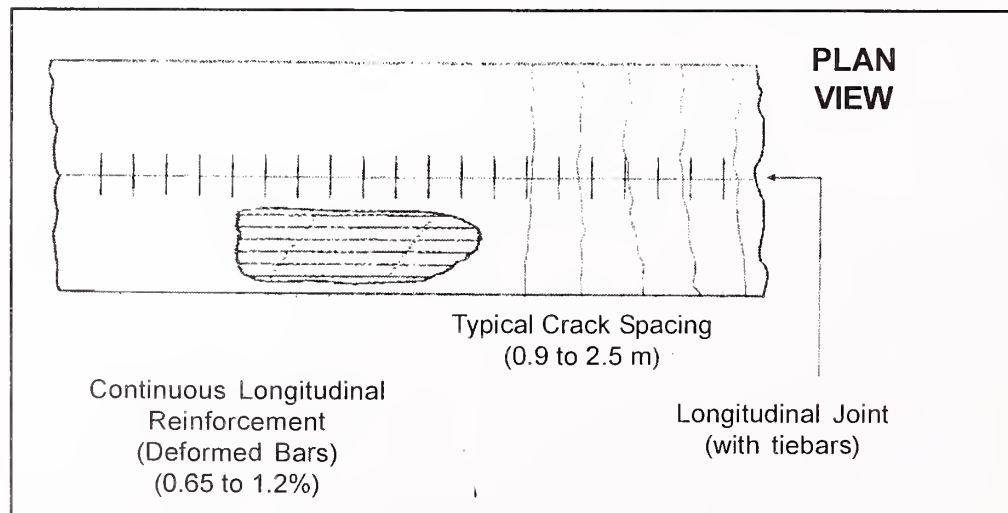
Continuously Reinforced Concrete Pavement (CRCP)
